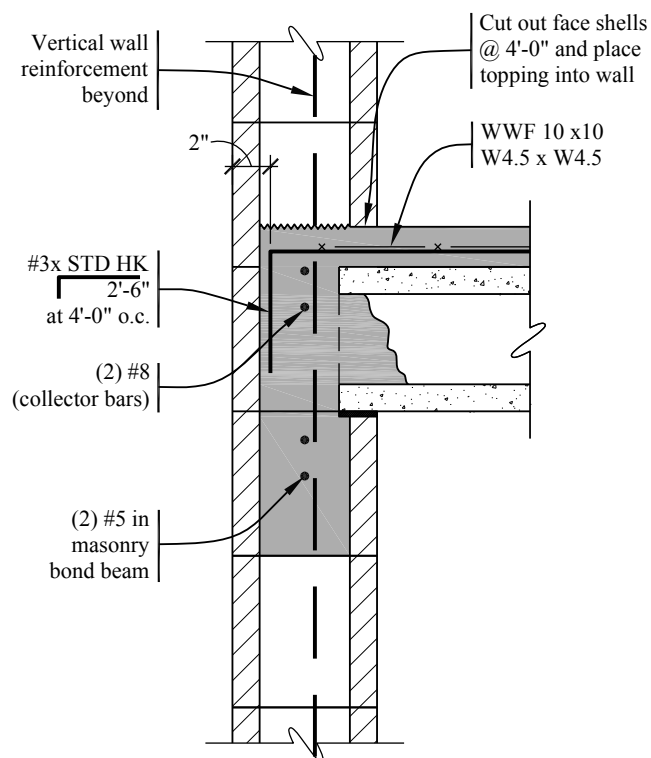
Exterior longitudinal wall-to-diaphragm reinforcement and out-of-plane anchorage - Joint 4
